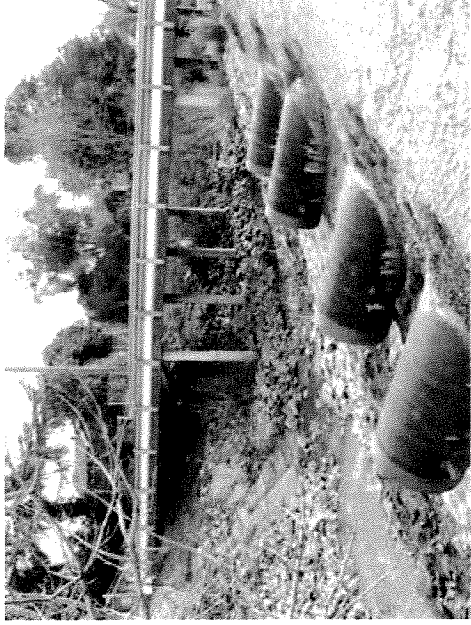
Outfall pipes upstream of McAllen Flashboard Dam base
